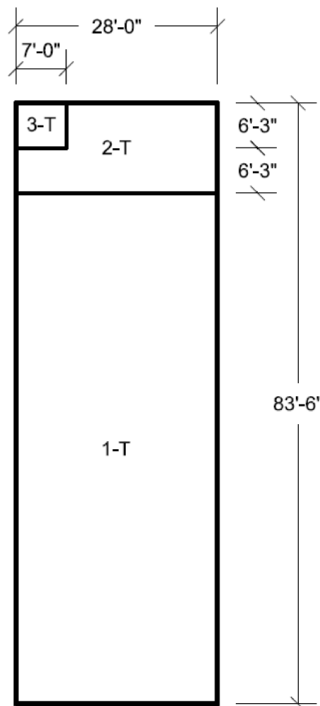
H.6-104 UHS Basin North Buttress Looking West & UHS Basin South Buttress Looking East Transverse Reinforcement Zones
